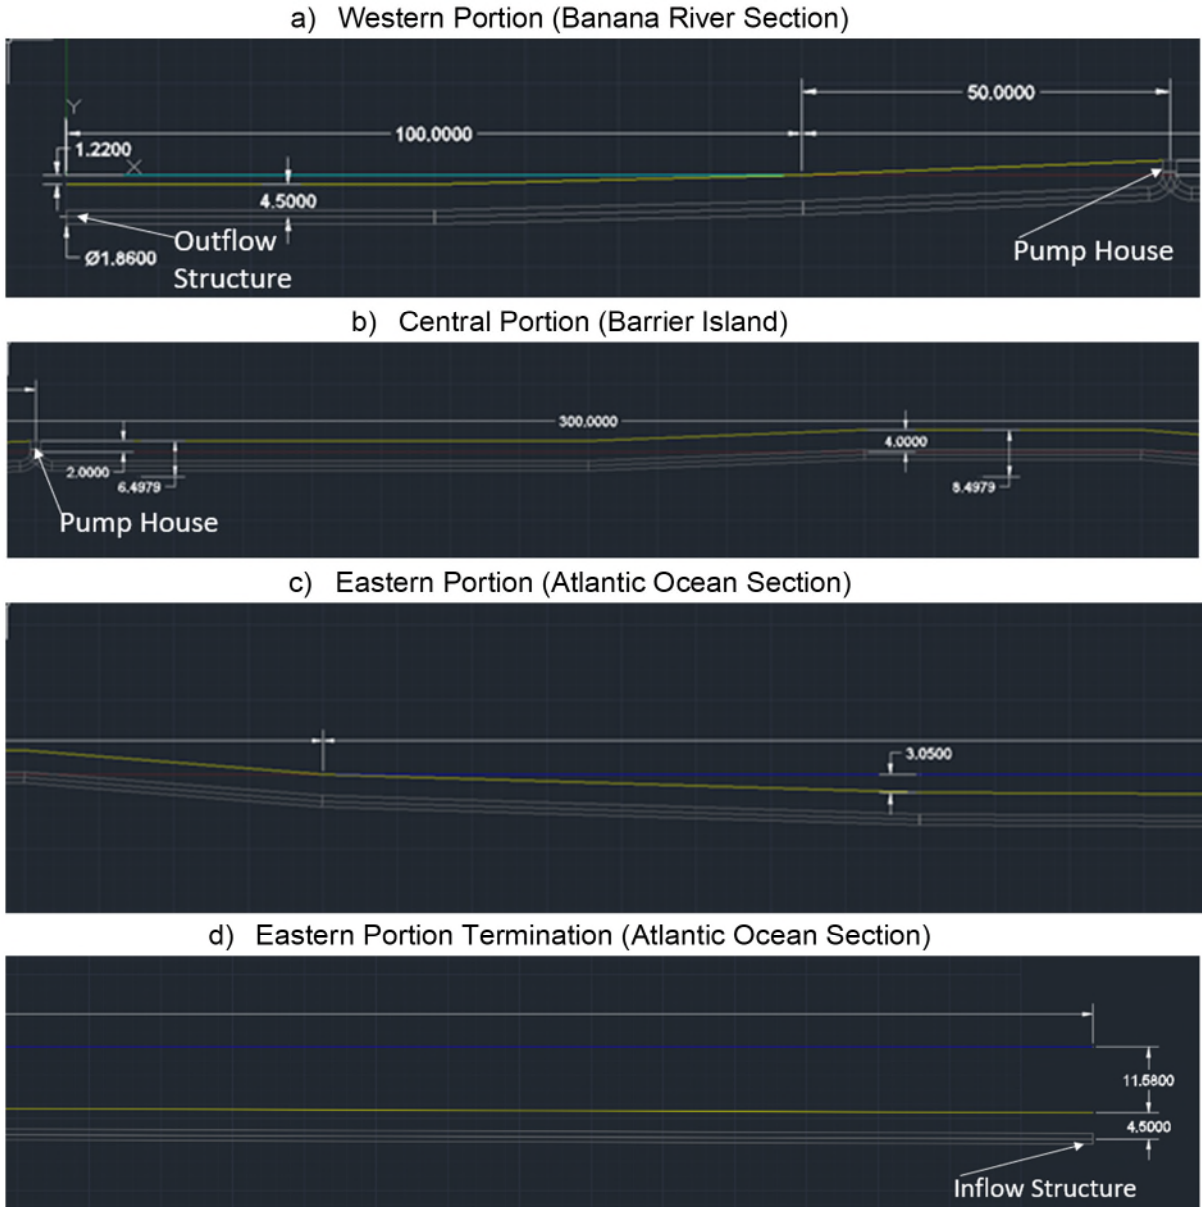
Temporary inflow pilot system side view with pump split into four sections: a) western, b) central, c) eastern, and d) eastern termination. Outflow, inflow, and pump house locations are indicated, but the structures are not shown.
